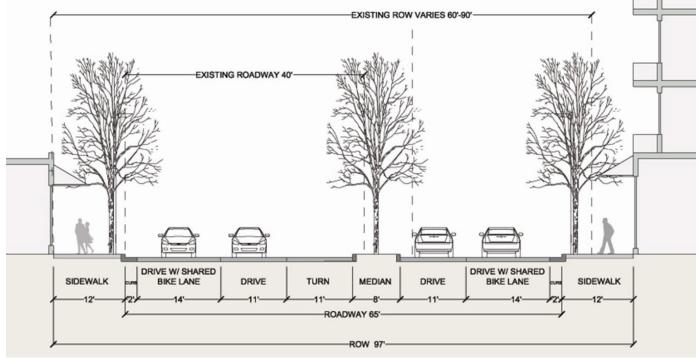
RASAP 17TH STREET TYPICAL SECTION PROPOSAL
